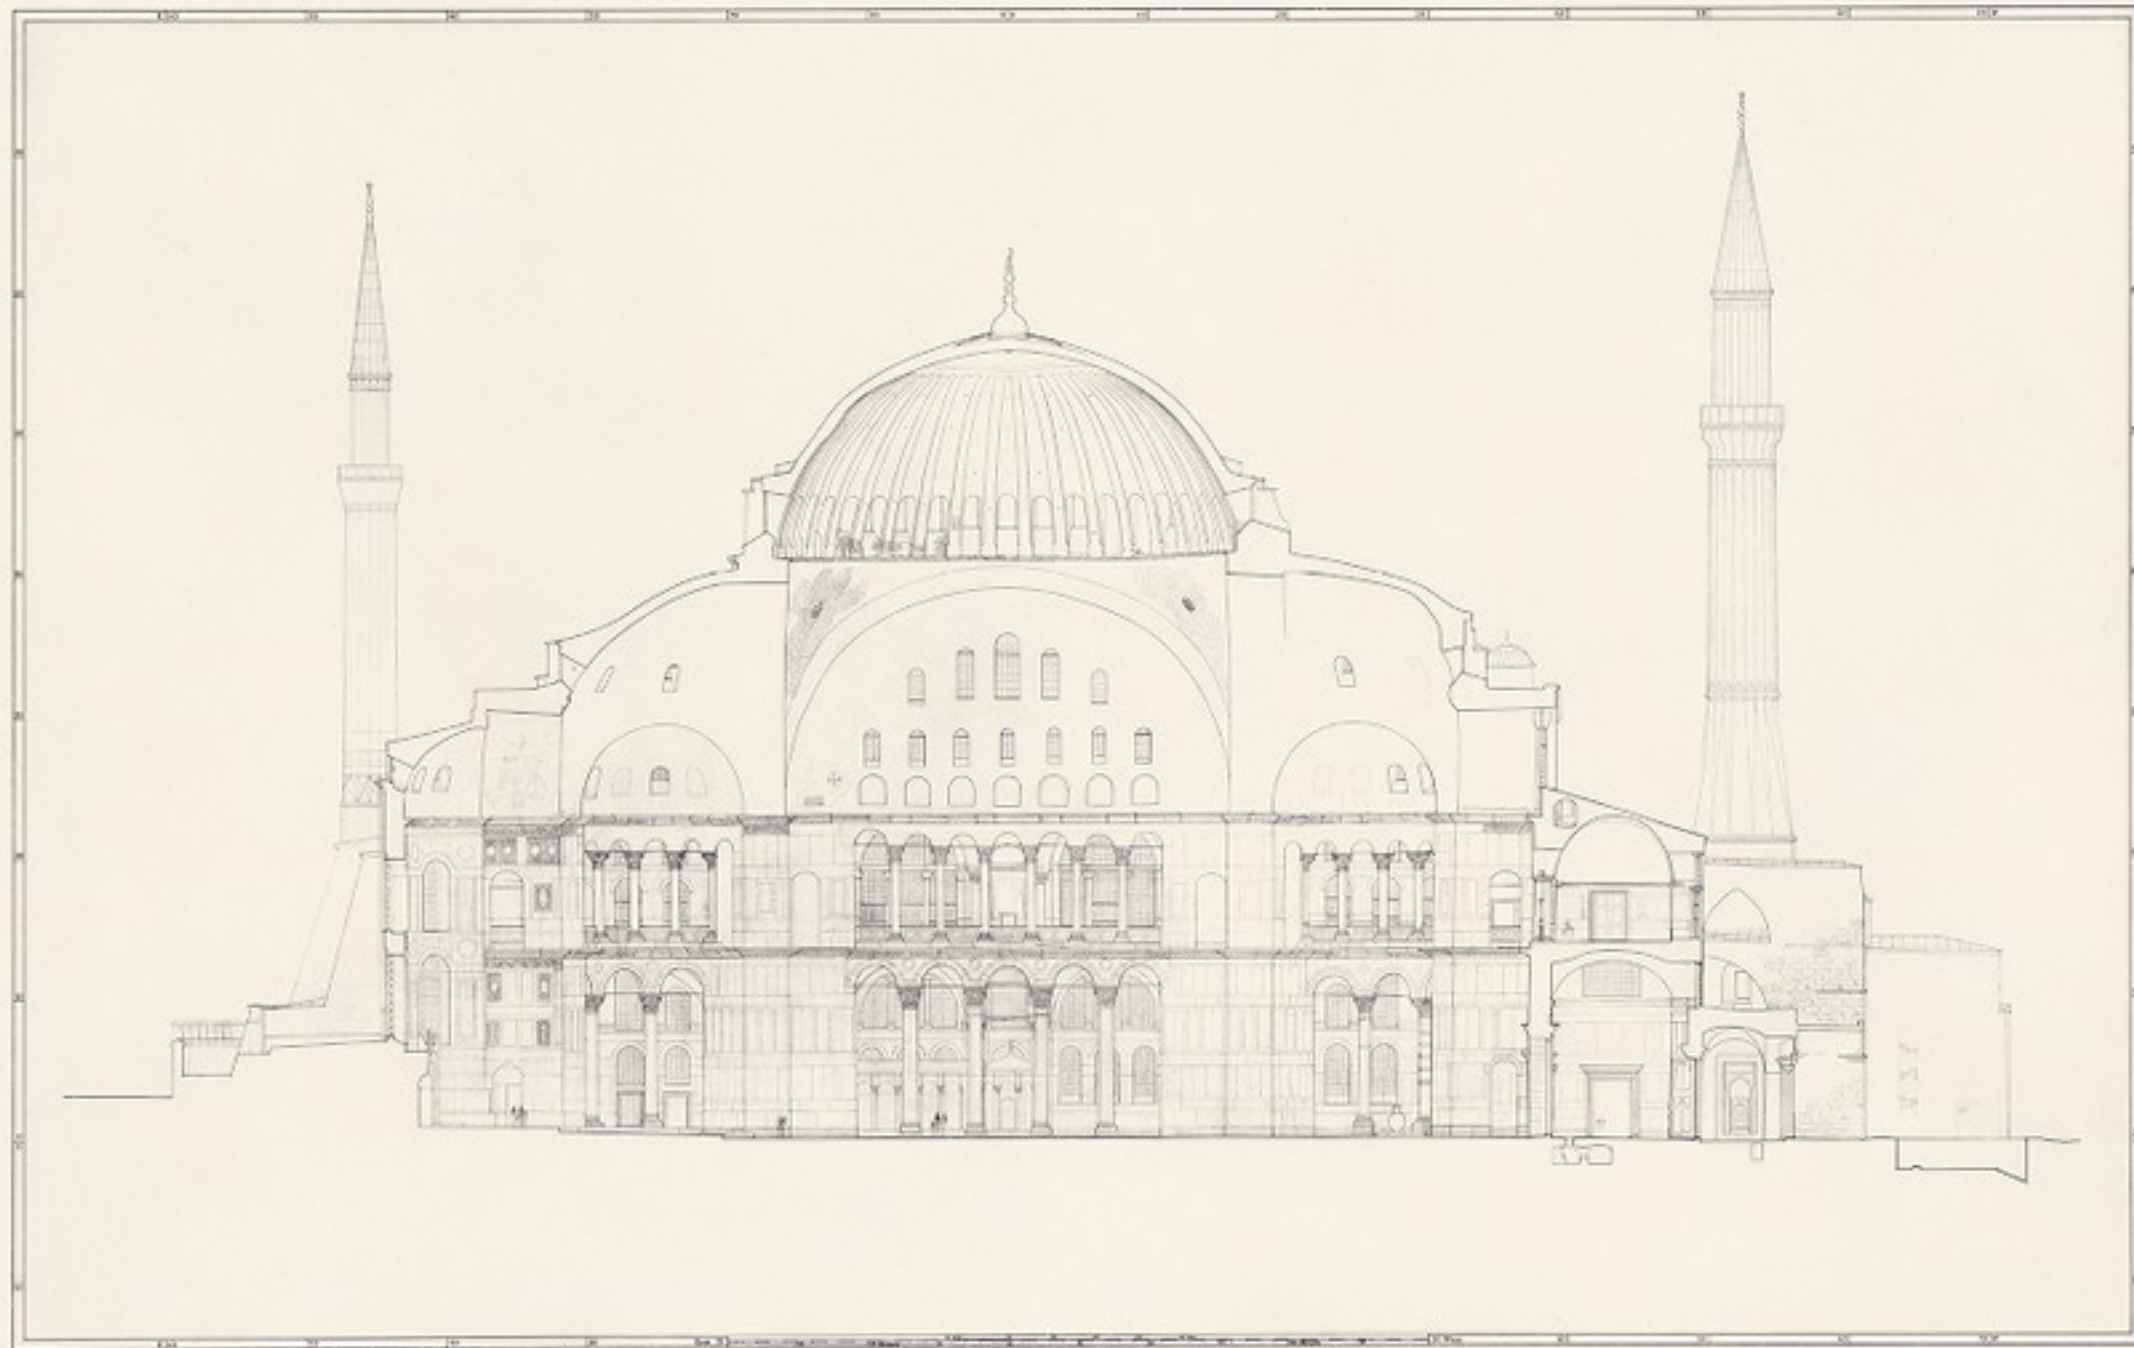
LONGITUDINAL SECTION, LOOKING SOUTH
